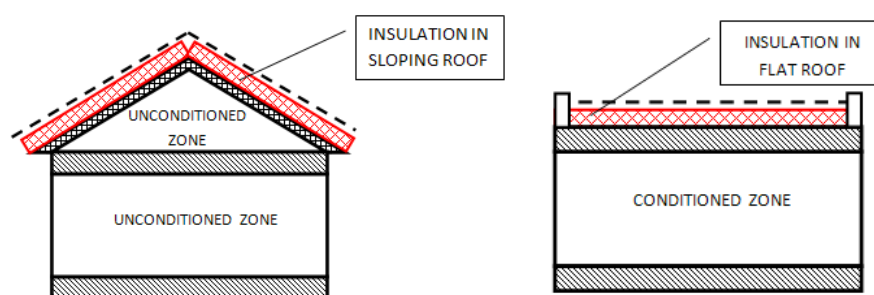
Insulation layer location for sloping and flat roof (Source: Boneta et al., 2013)
